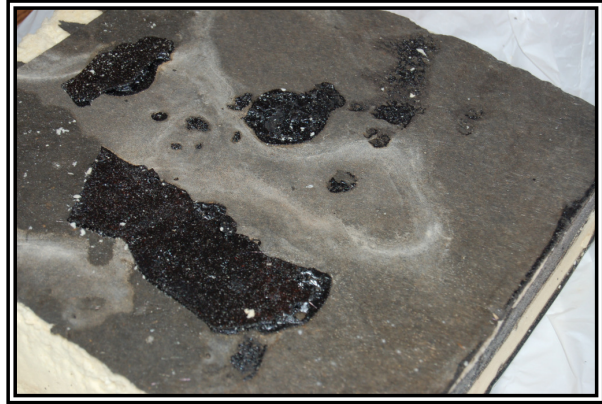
Concrete roof decks can undulate and create depressions where adhesives need to be installed “heavy” and insulation layers need to be thin to conform to the deck profile. Here, the asphalt was not installed heavily enough and the insulation board was too thick to conform. Note the moisture stains, as well.
